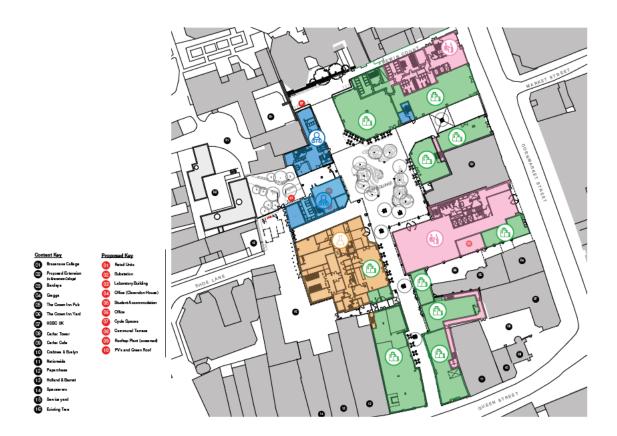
Ground Floor plan of uses: Pink - Office, Orange- Research and development, and Blue Student accommodation, Green – rtail/ restaurant/ café.
